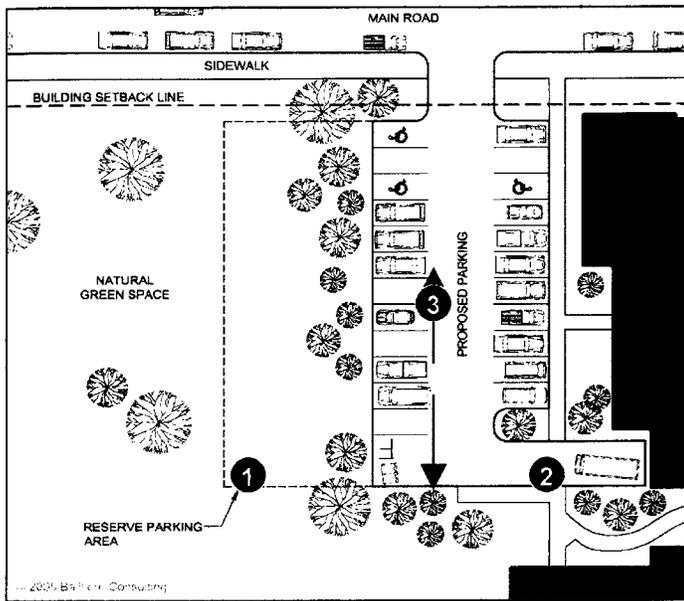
Sidewalk configuration. See The City of Kingston Engineering Department for tree planting and curbing details.
